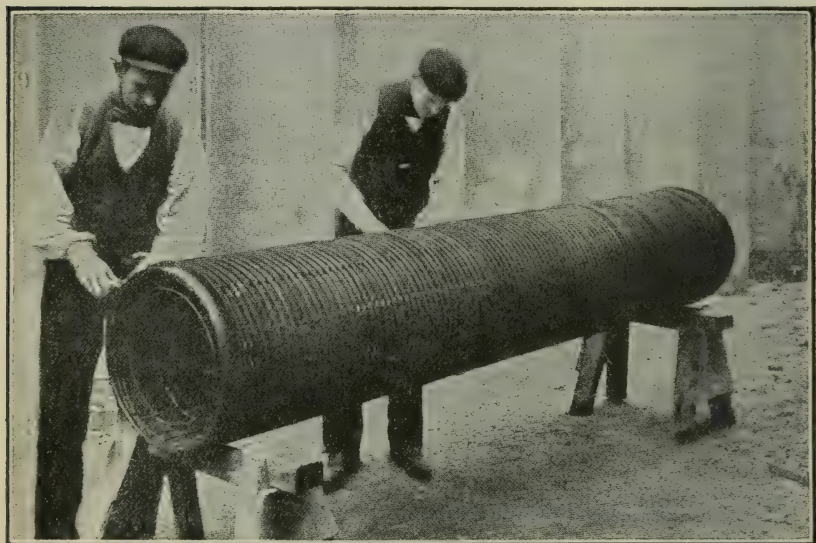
“Bonna” Pipe : Application of External Reinforcement.
